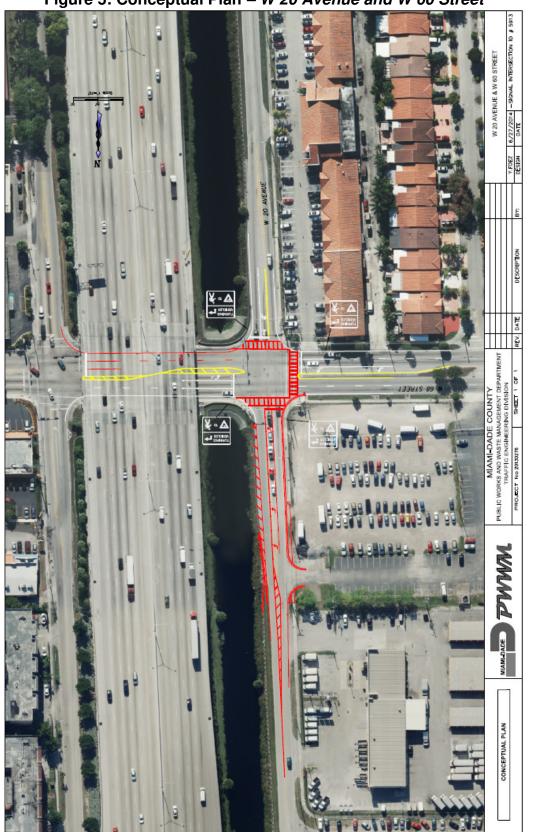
Conceptual Plan – W 20 Avenue and W 60 Street
